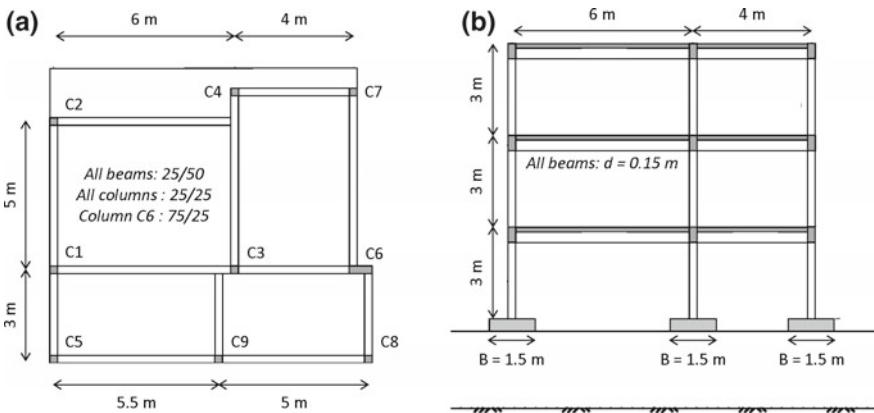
Geometry of the 3-storey building: a plan view; and b cross-section
